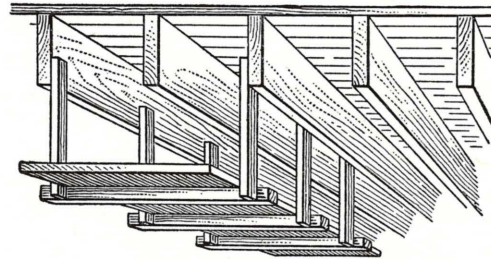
A storage rack for screens should be built in the garage, attic, or basement
